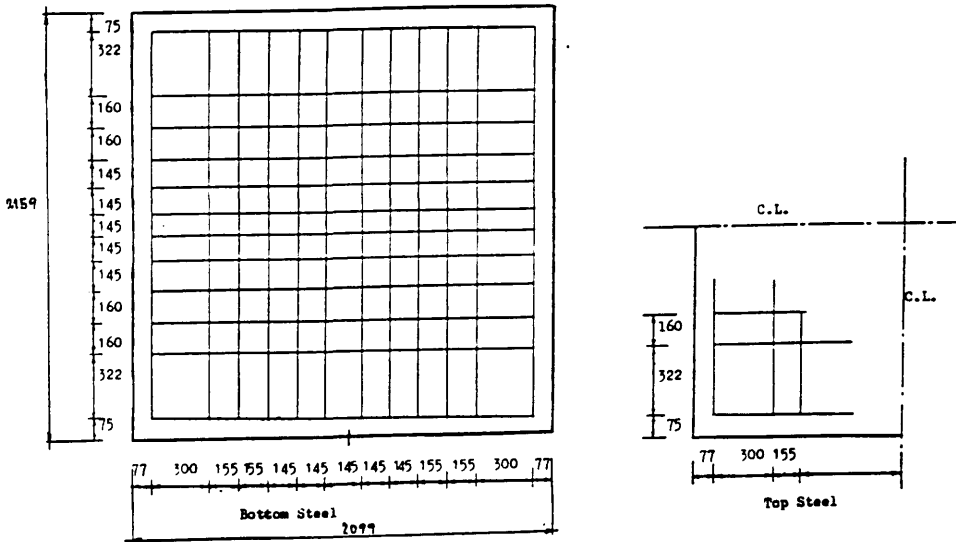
Plate A: geometry, reinforcement, loading and boundary conditions.
